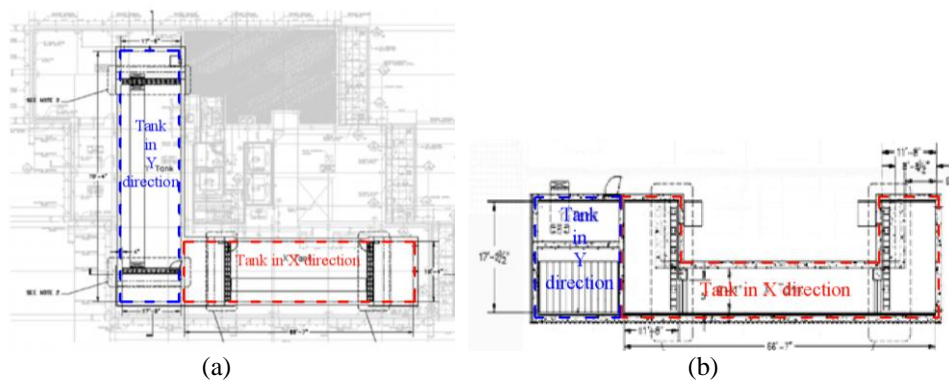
TLCD design for the Random House Tower: (a) 50th floor plan; (b) East-West section through building top.
